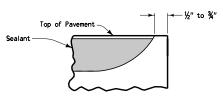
DETAIL "A"(Sawcut formed by conventional concrete saving equipment)
